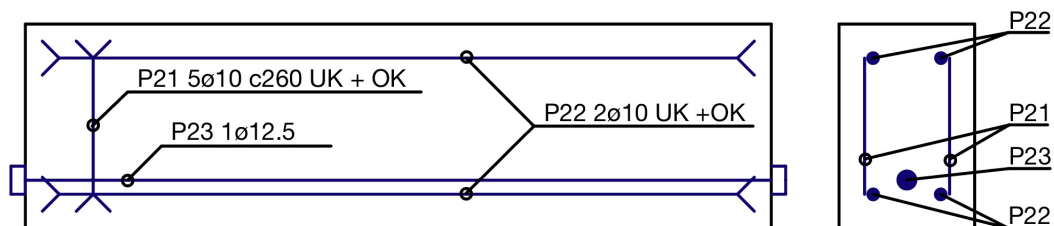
Reinforcement drawing of Model 2 with straight prestressed reinforcement
